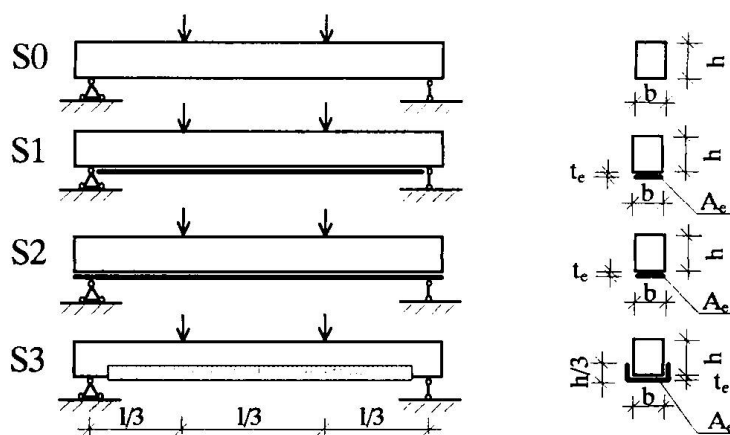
Diagrams of reinforcing of beams with external glued reinforcement
